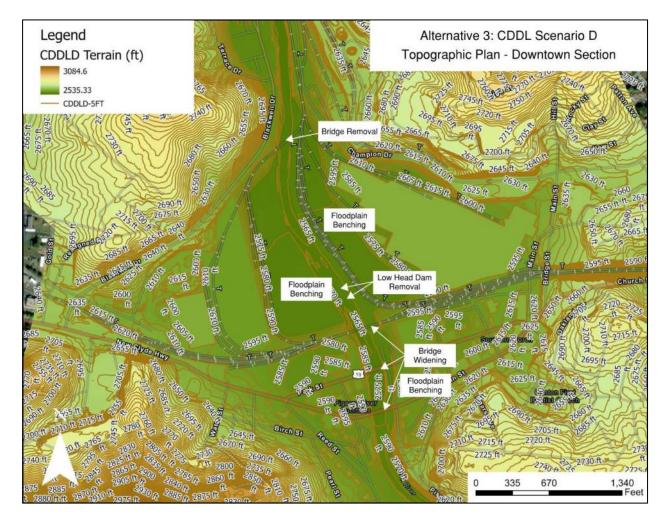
Alternative 3 Topographic Plan Schematic
